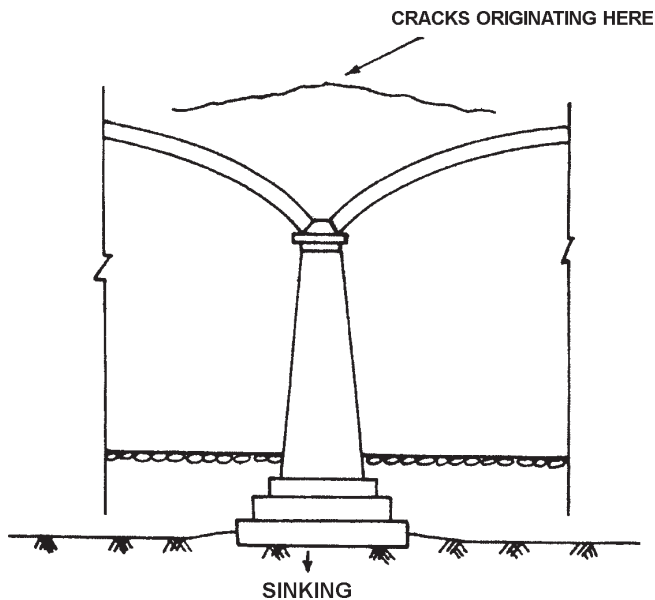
(b) Cracks in spandrel wall due to sinking of pier
